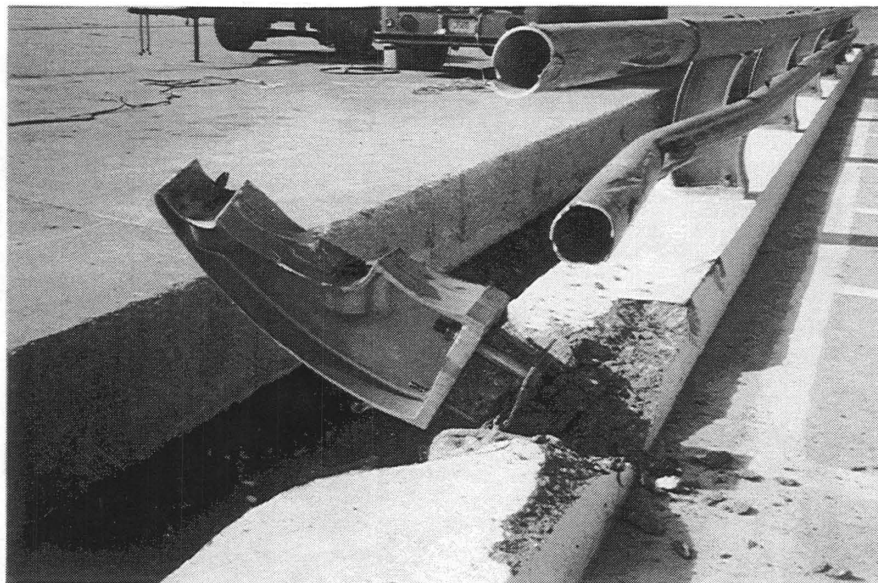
Bridge Rail Damage, Test FPAR-2 (continued).
